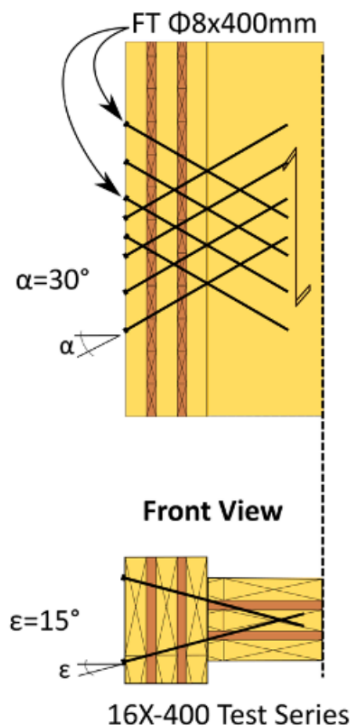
Detailing of 16X-400 STS connection. Elevation and plan view, respectively. (BROWN et al., 2021)
